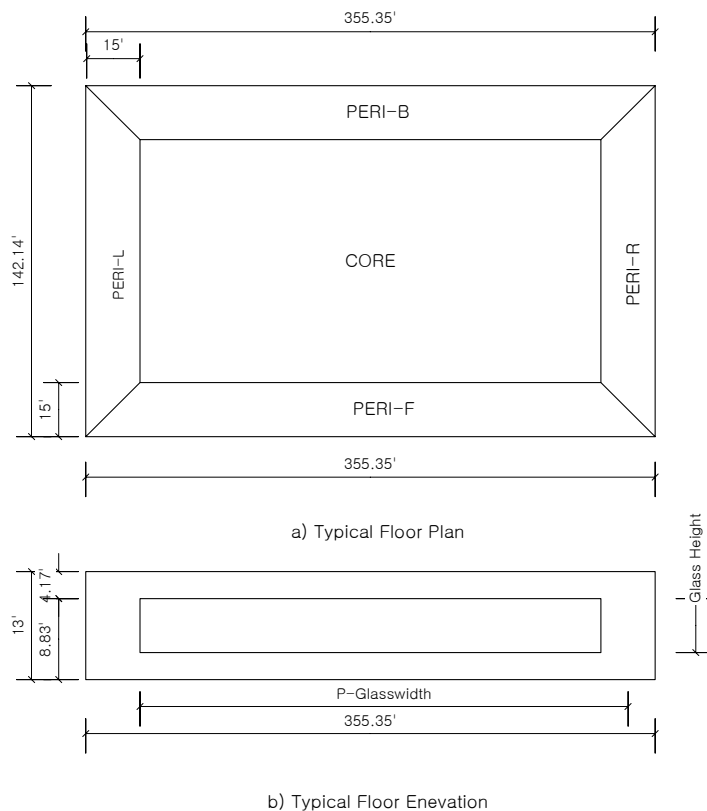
Typical floor plan and elevation of the 90.1-1989 budget model.
